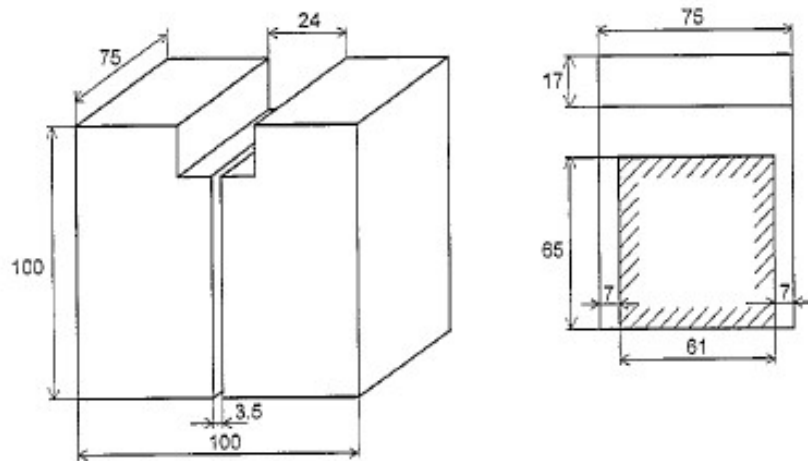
Geometry of the specimen for WST to enable stable crack propagation (dimensions in mm) [32].
